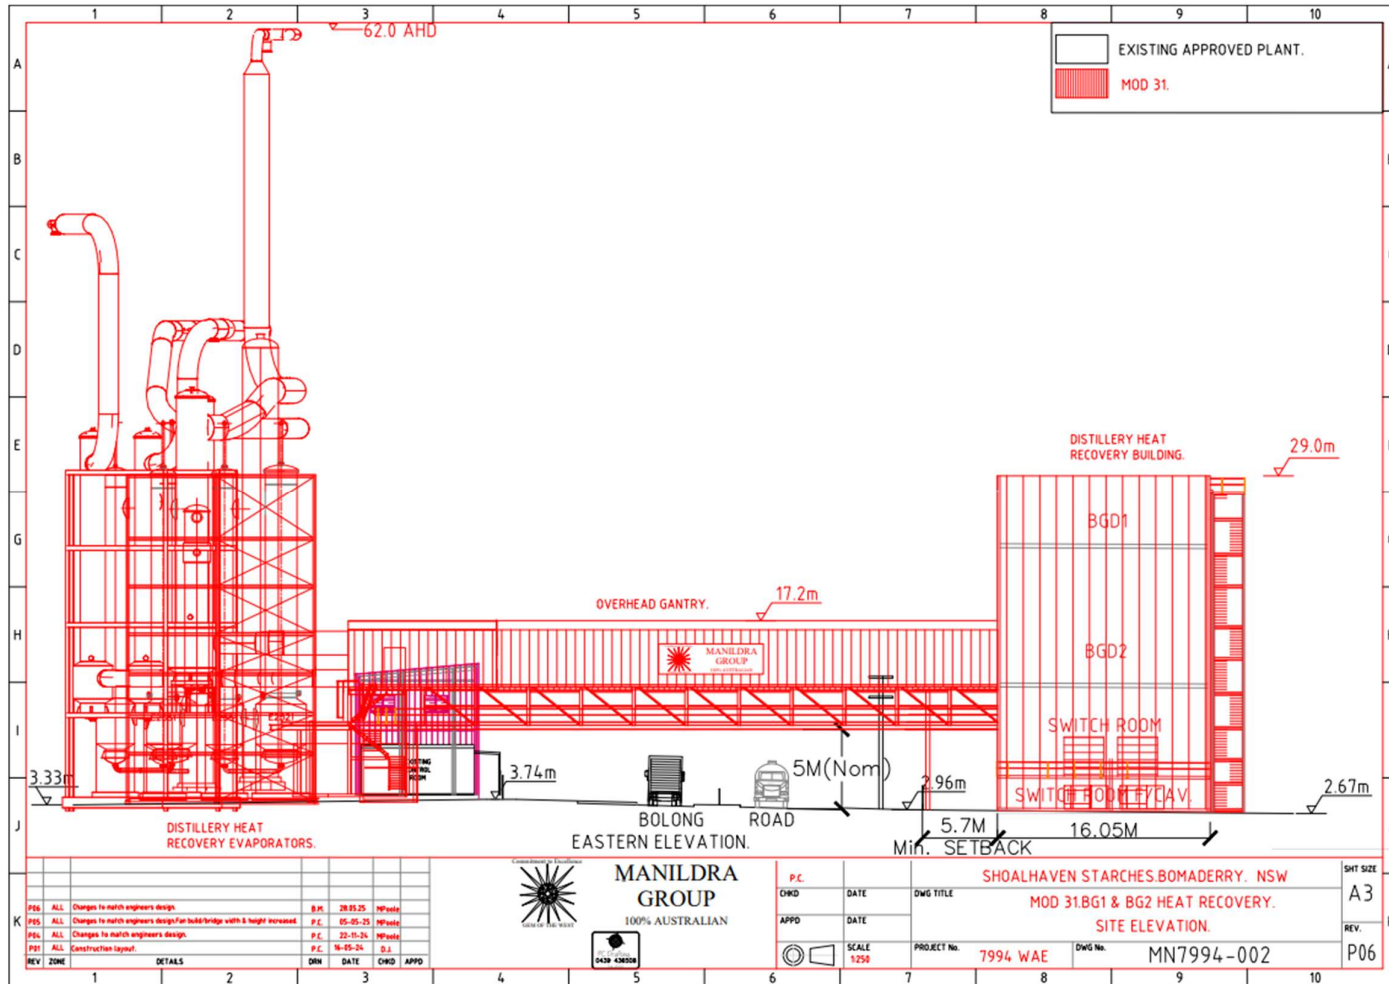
Proposed Heat Recovery Evaporators (left) gantry (centre) and Building (right) (Source Shoalhaven Starches)
